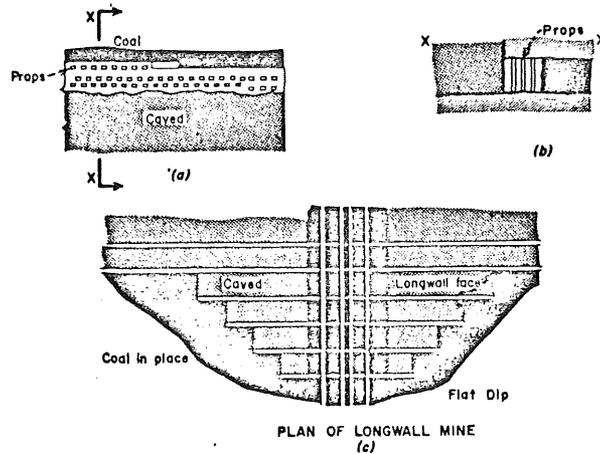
Longwall mining (Stahl and Dowd¹⁴).
